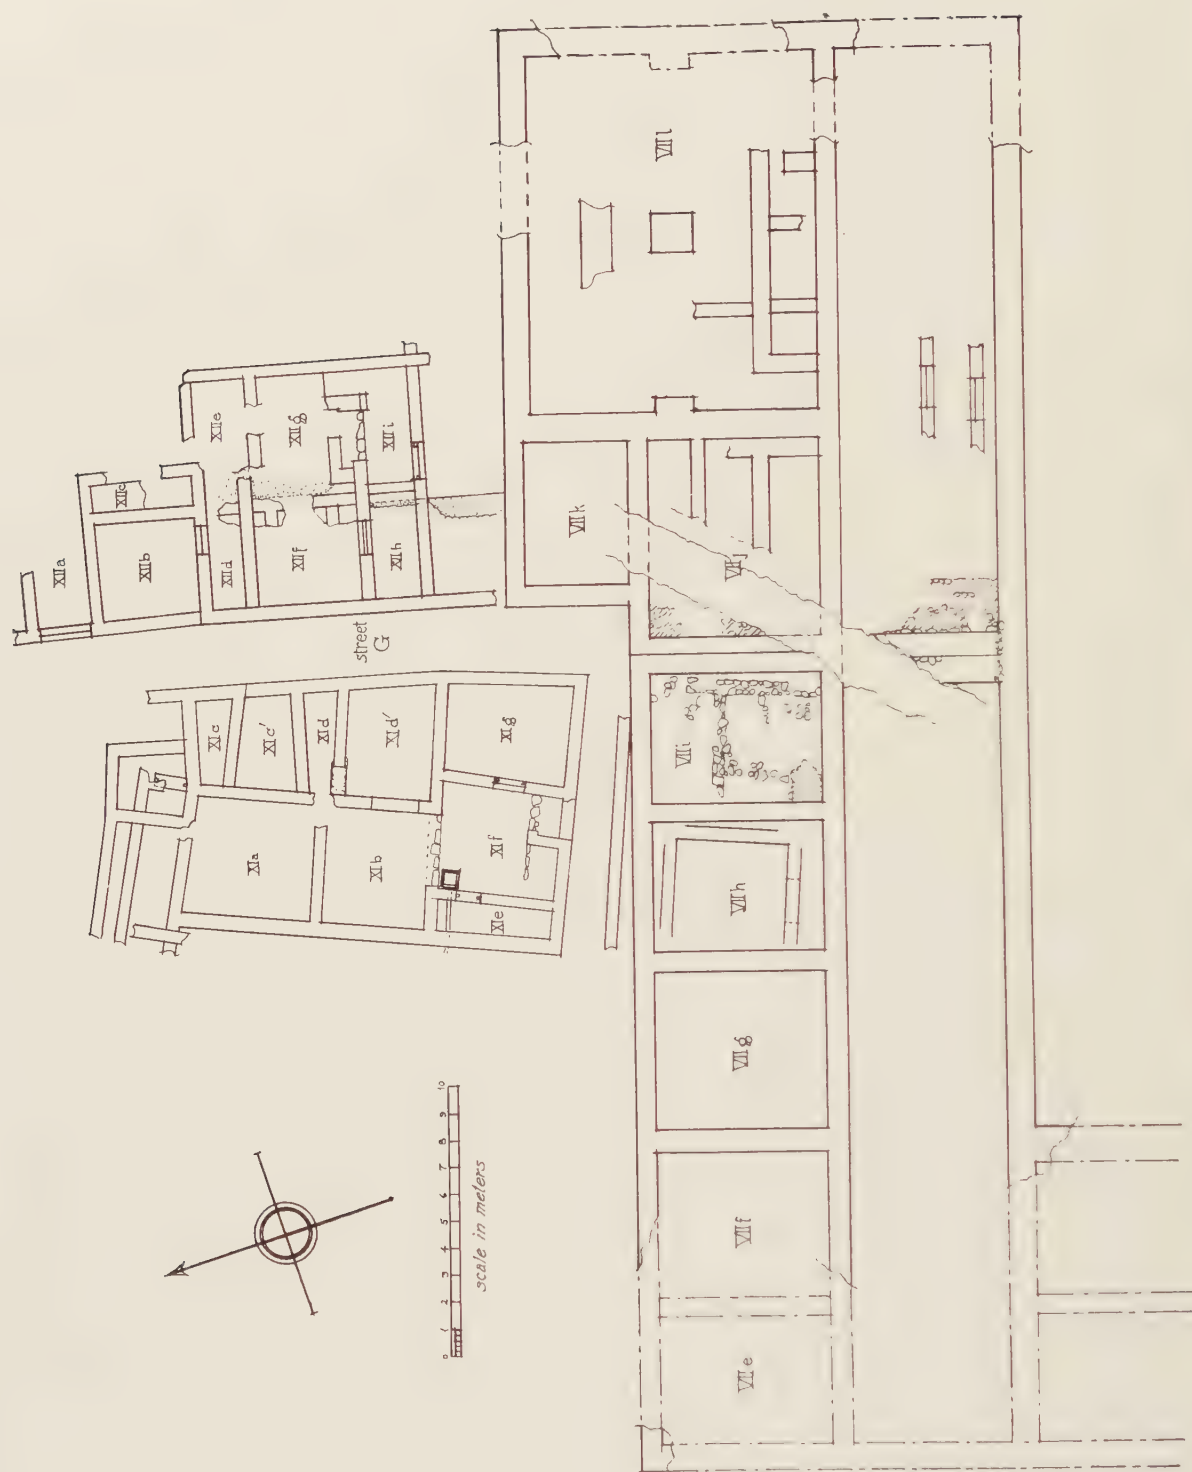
North Wing of Stoa and Houses on Point. From Notebook Sketches
